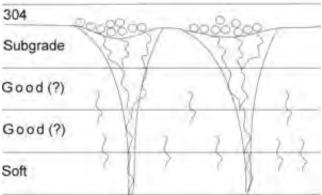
F - Stage 3 Hauling, Grading, and Placing 304
